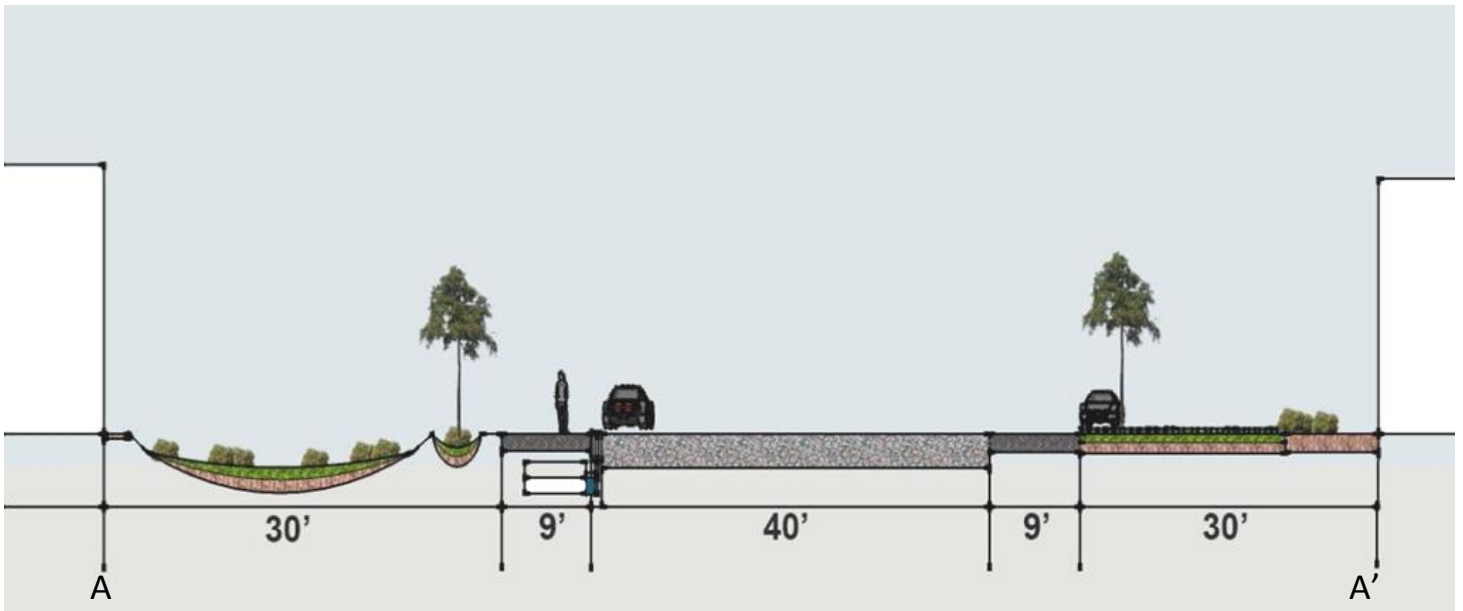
Street section drawing. Created by Pin-hao Huang (May2014)
